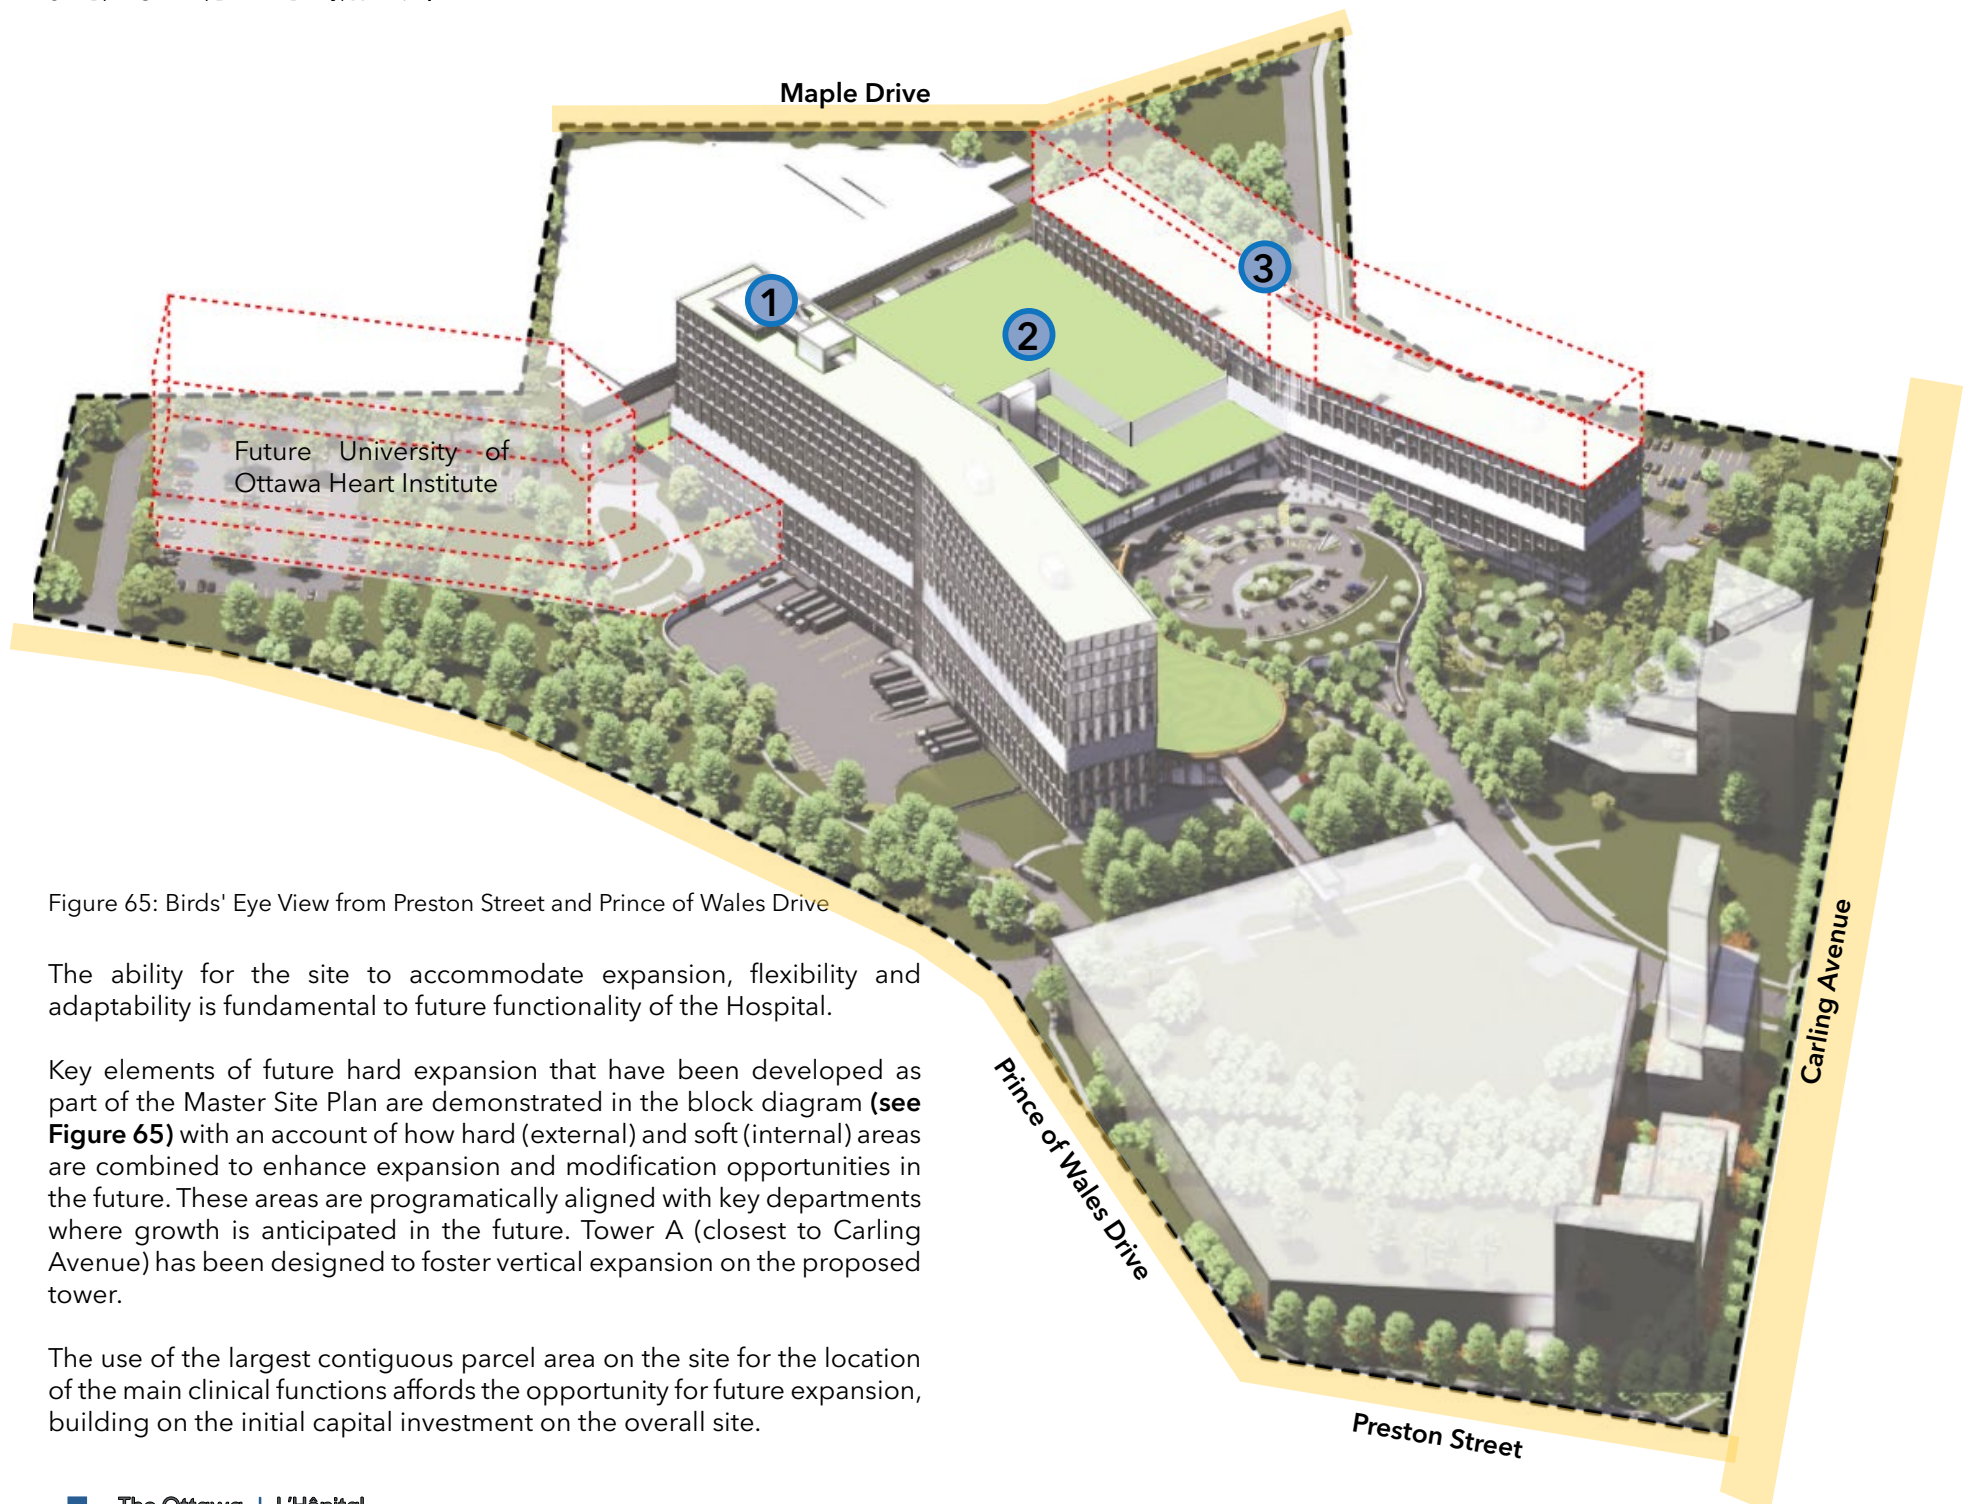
Birds' Eye View from Preston Street and Prince of Wales Drive
